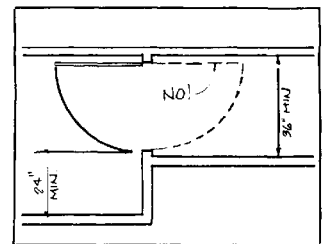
Hallways should be at least 36 inches wide and provide 24 inches minimum wall space on the latch side of a door swinging toward the user.
